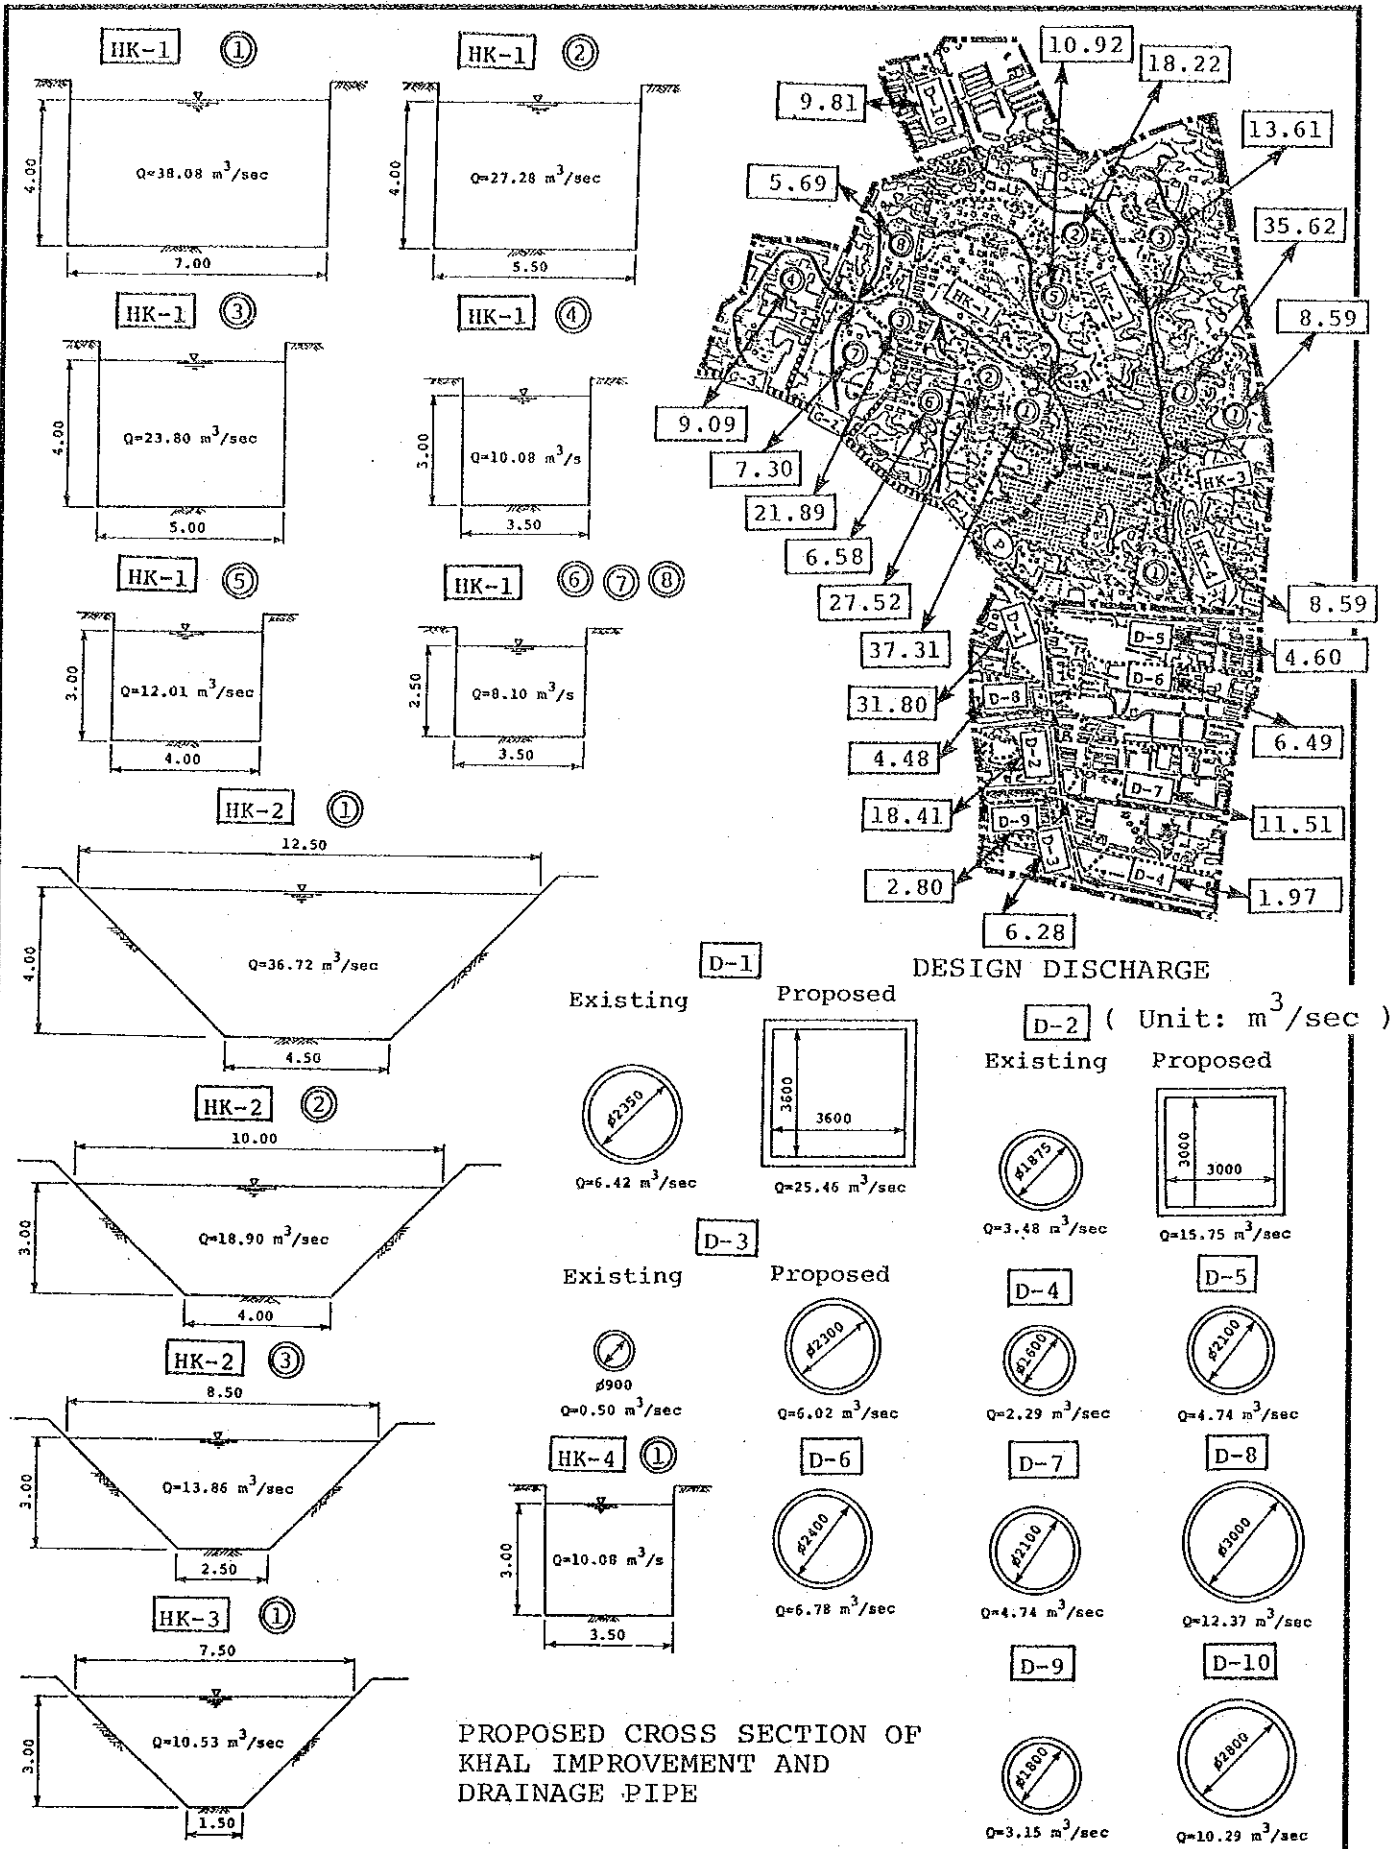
DESIGN DISCHARGES AND PROPOSED CROSS SECTIONS OF KHAL AND PIPE IN H ZONE
